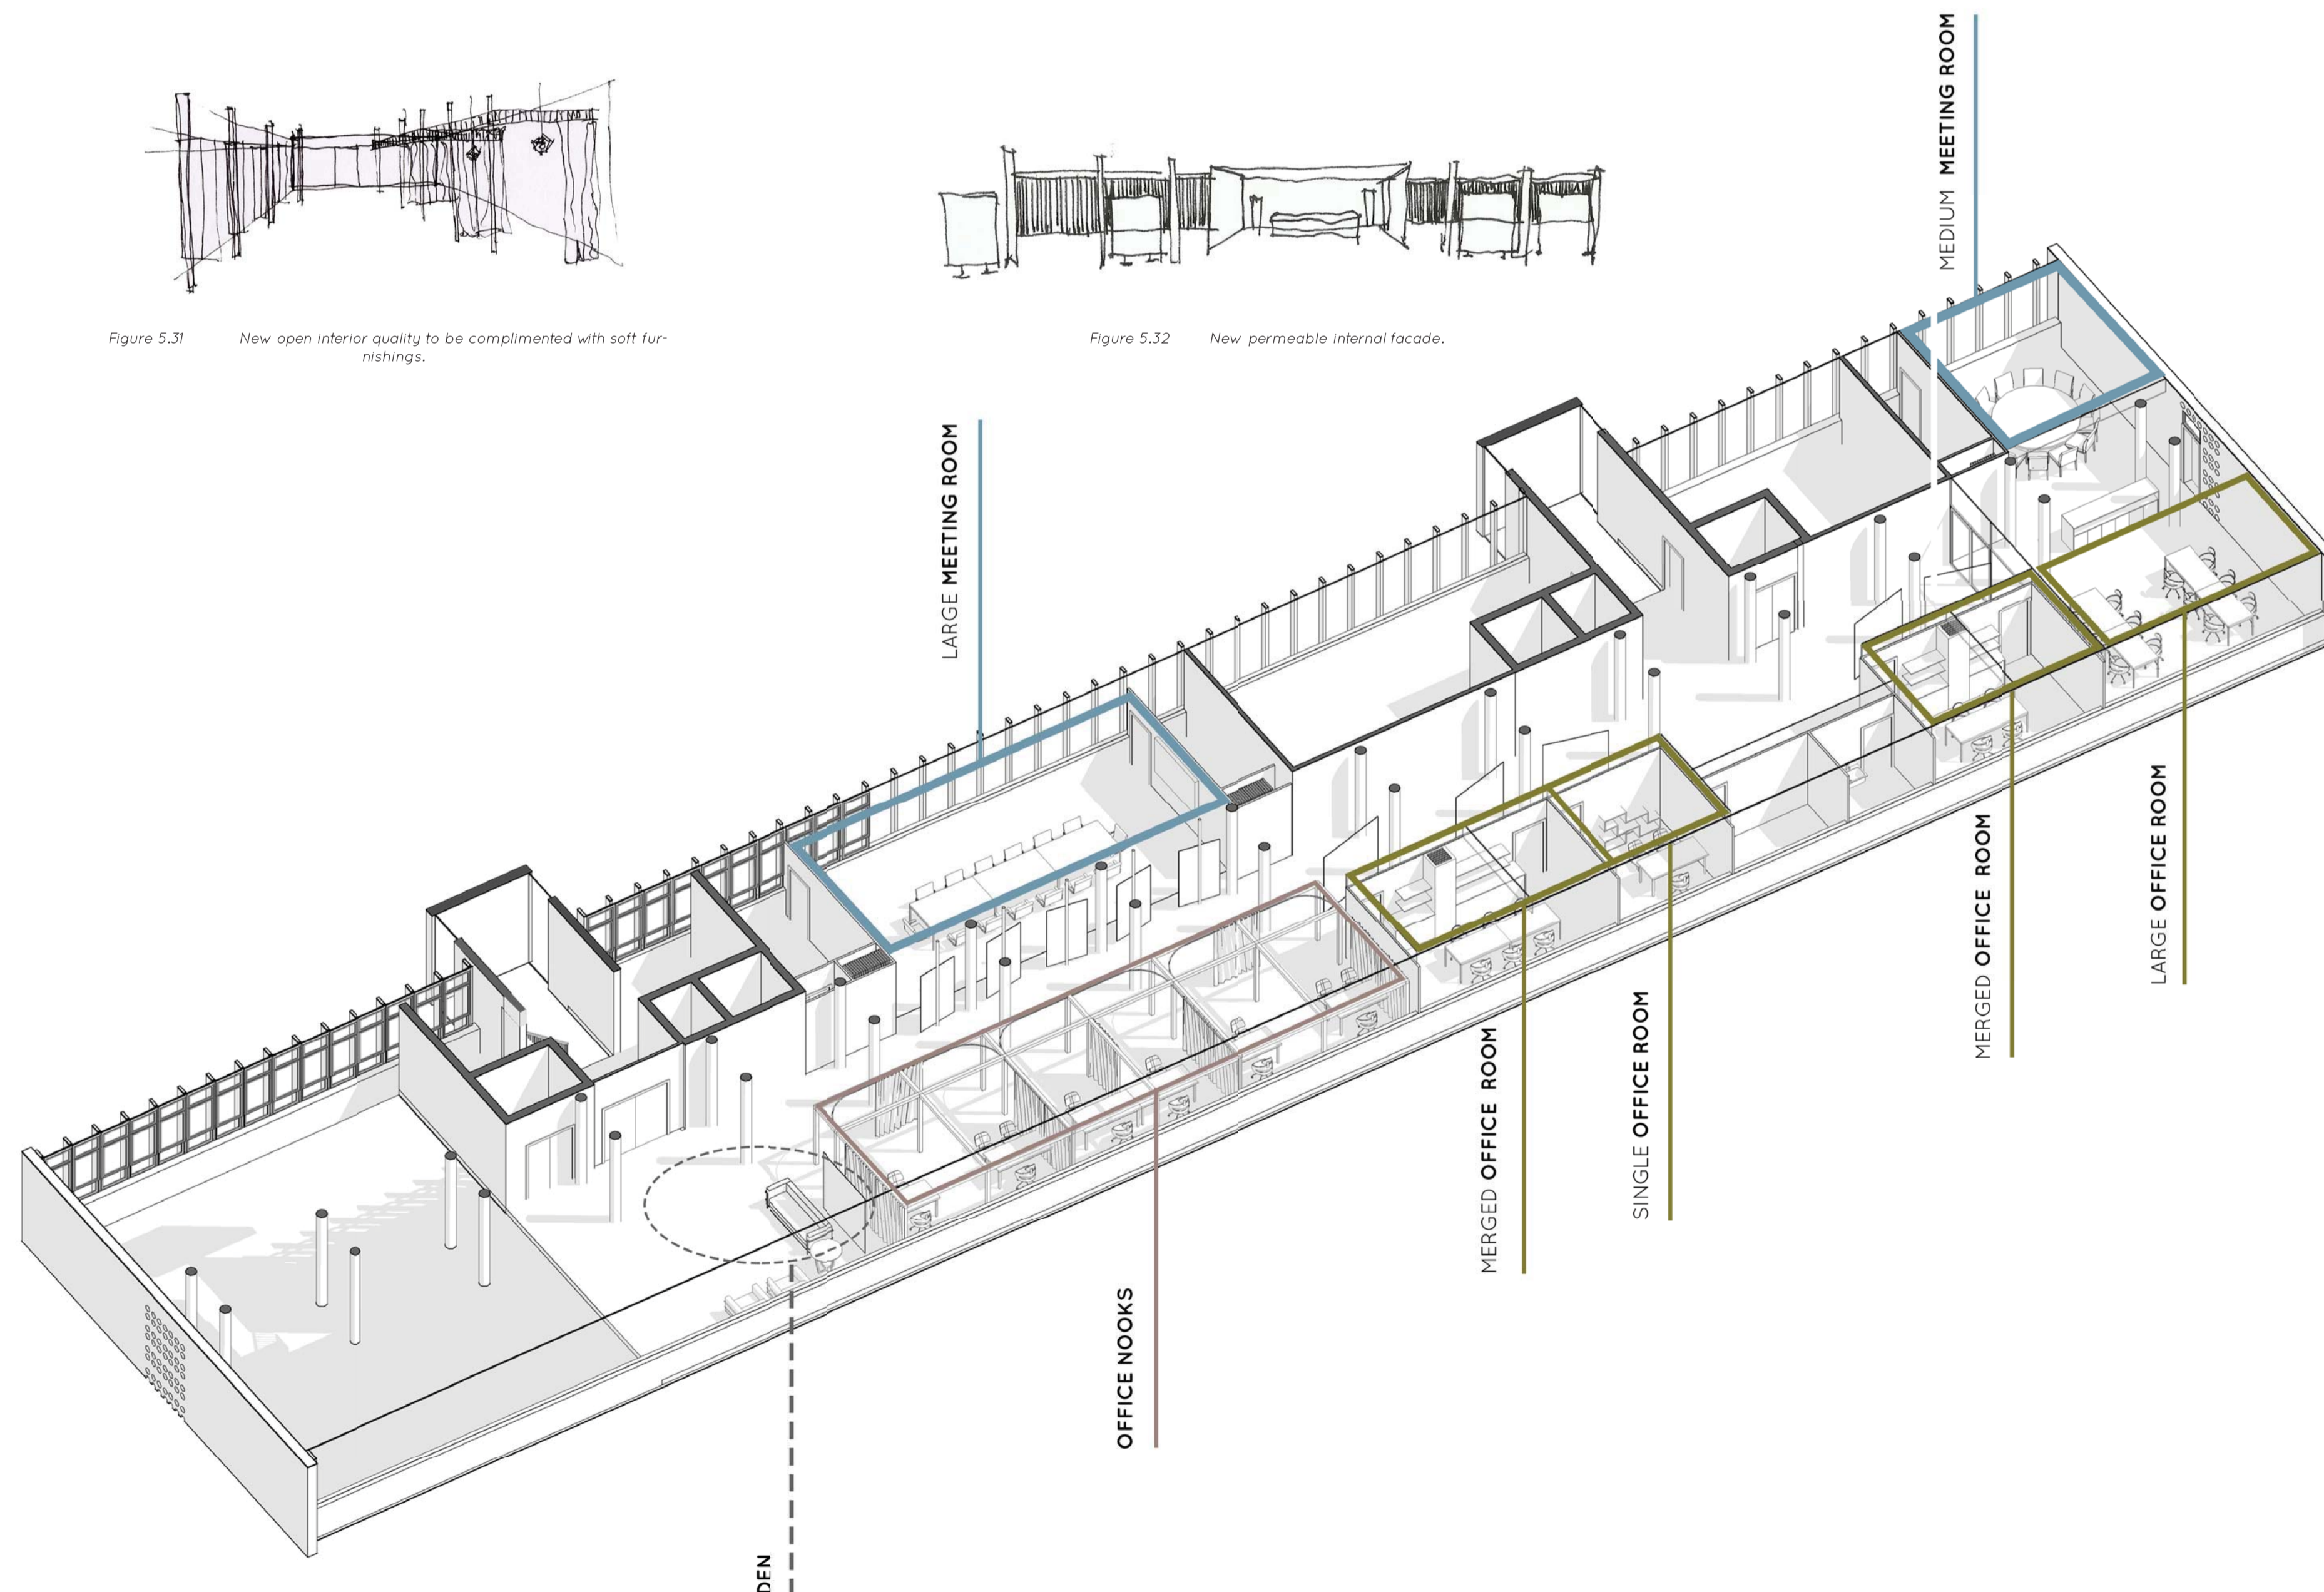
AXONOMETRIC VIEW OF THE FIRST/ SECOND FLOOR FORMAL WORKSPACE ENVIRONMENT
